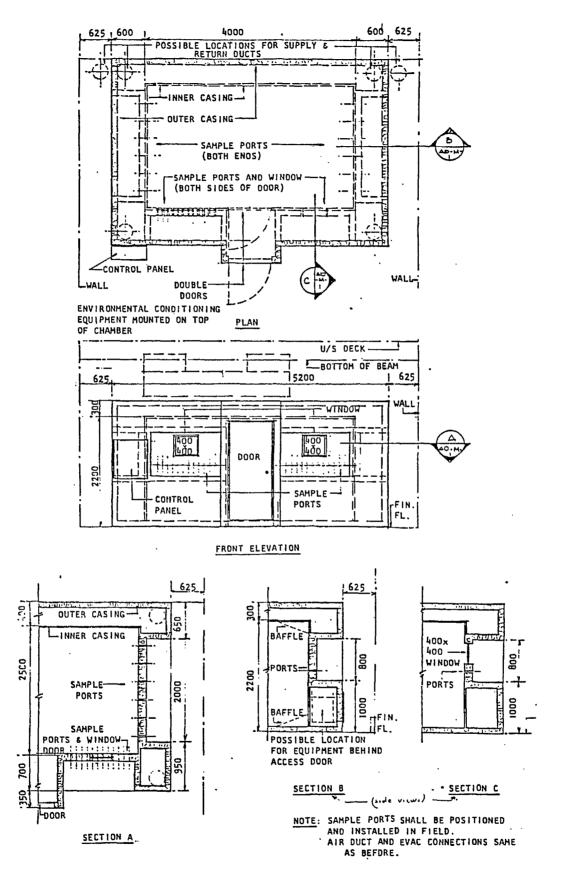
Plan, front elevation and several sections of the Radon/Thoron Test Facility.
